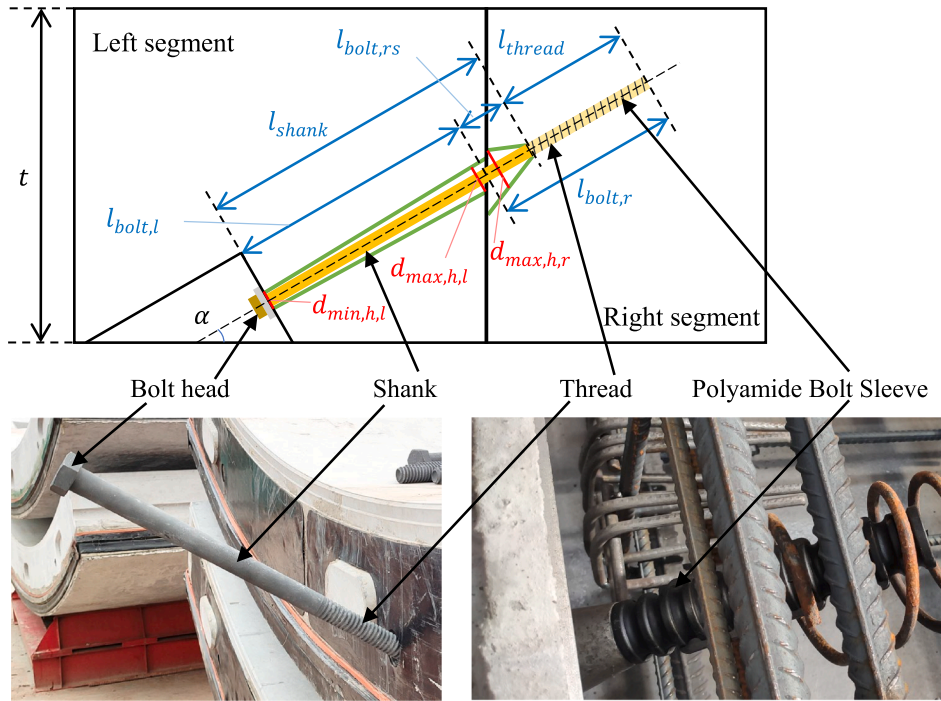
The typical structure of an inclined bolt crossing a circular joint.
